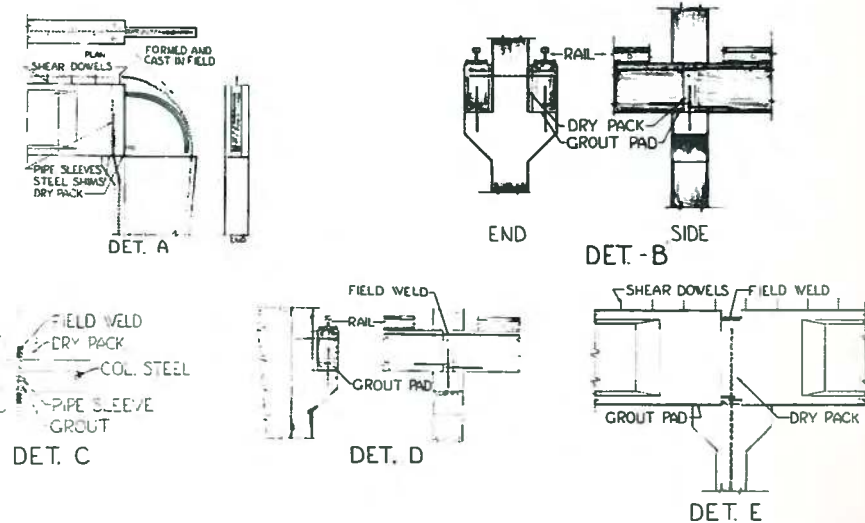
Drawings for two-bay and one-bay buildings with crane rails.
